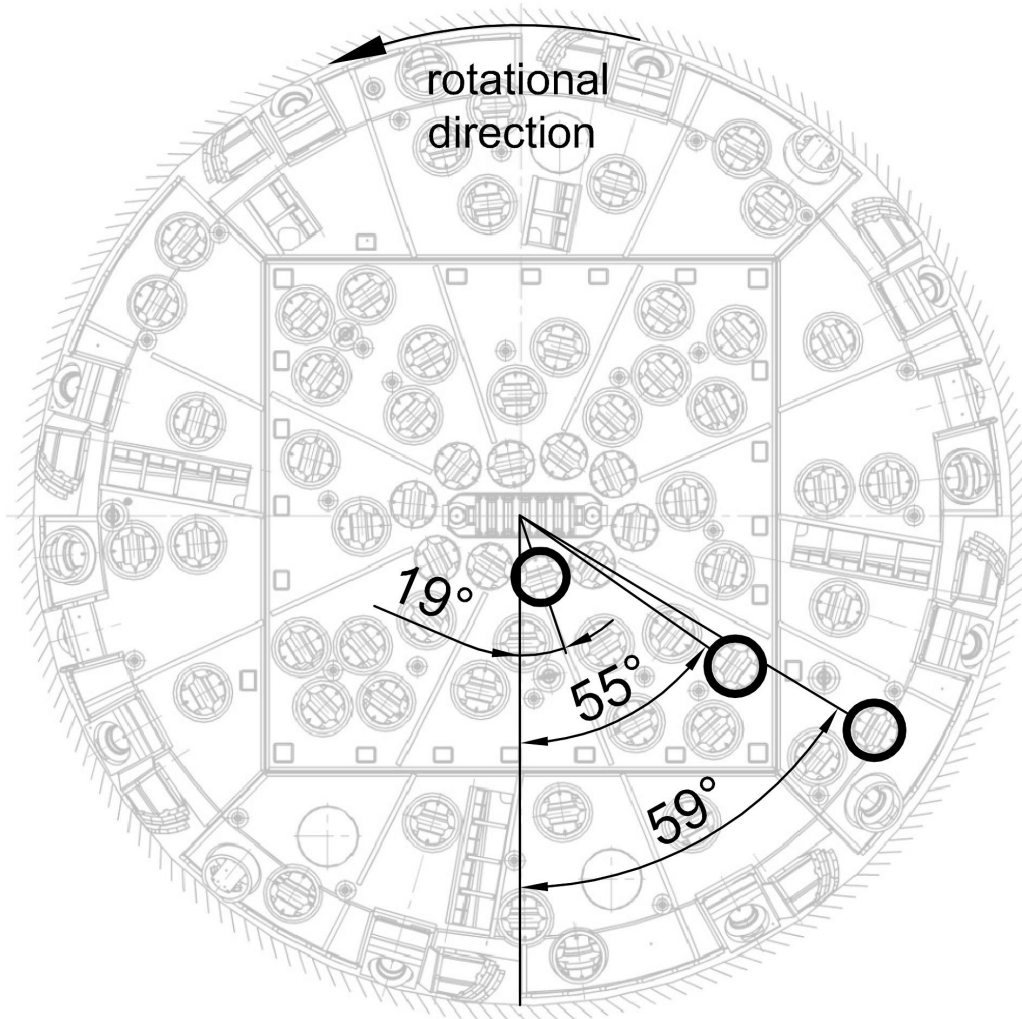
Cutterhead with three sensor-equipped disc cutters (cutterhead picture ©Aker Wirth)
